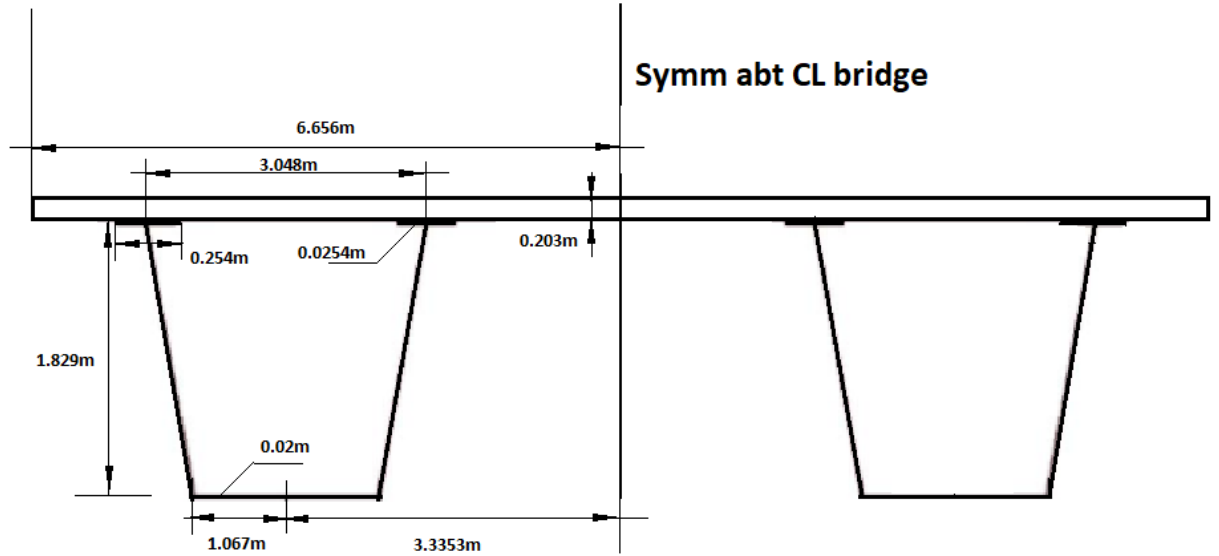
Typical steel box girder cross section (Case 3 L=235m)
